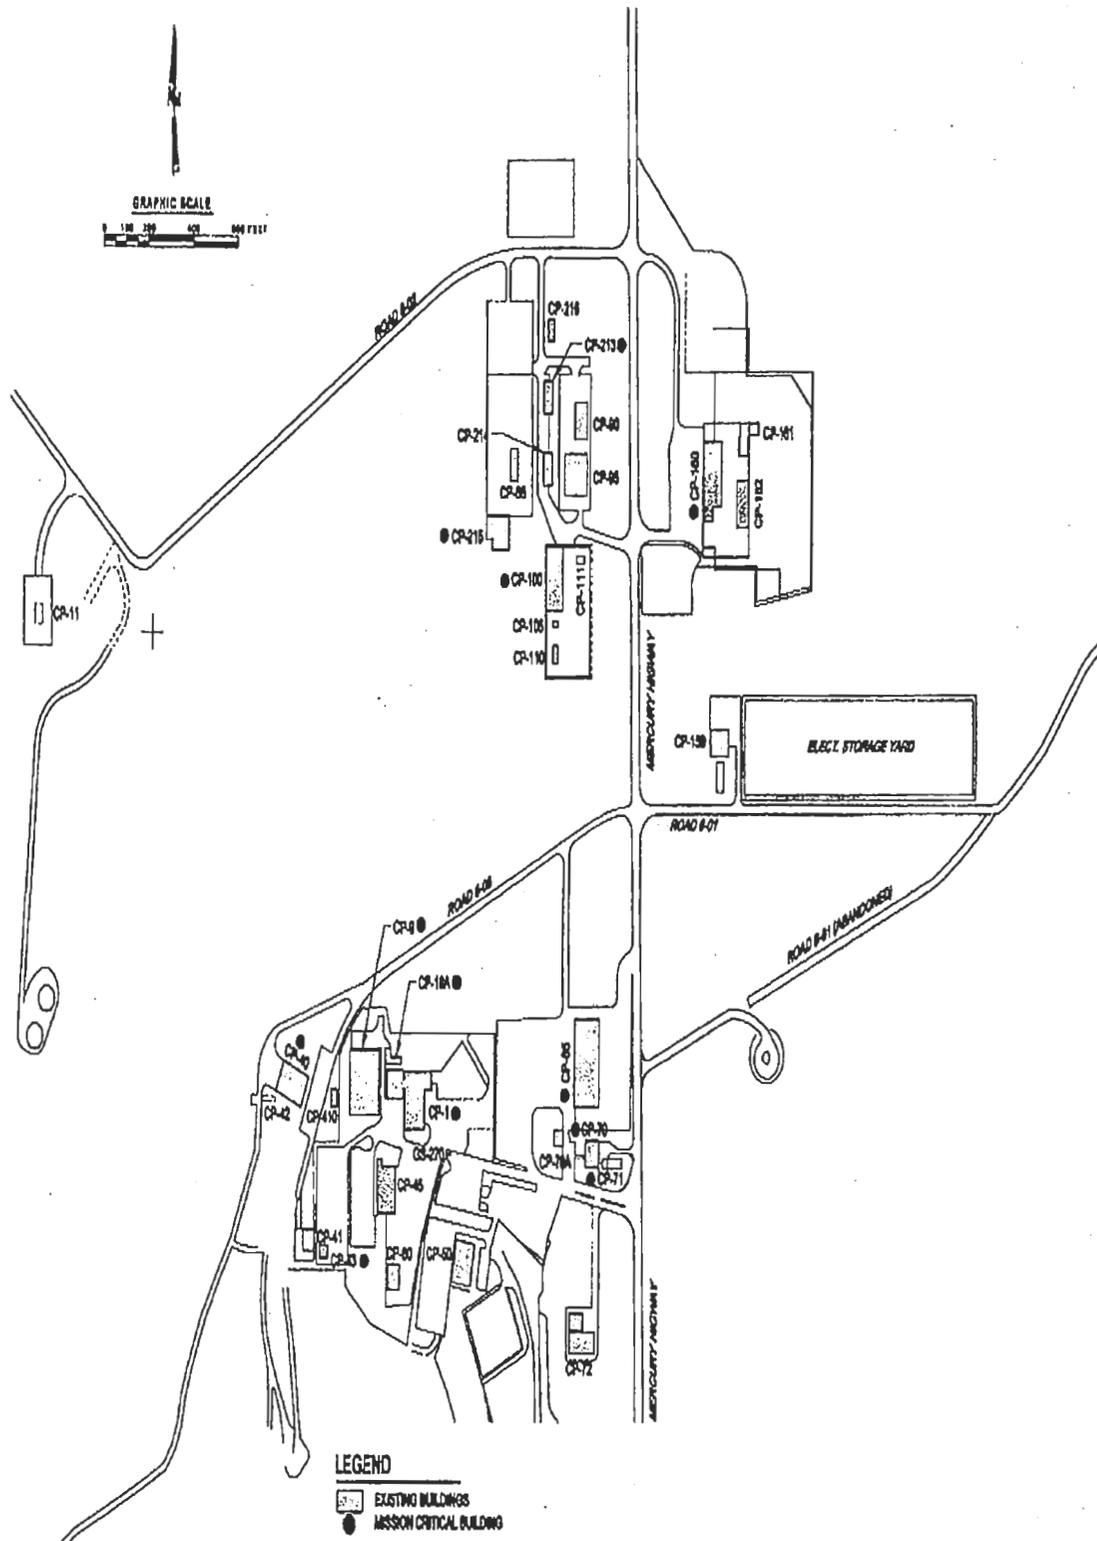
Area 6 (Control Point) Existing Site Plan
